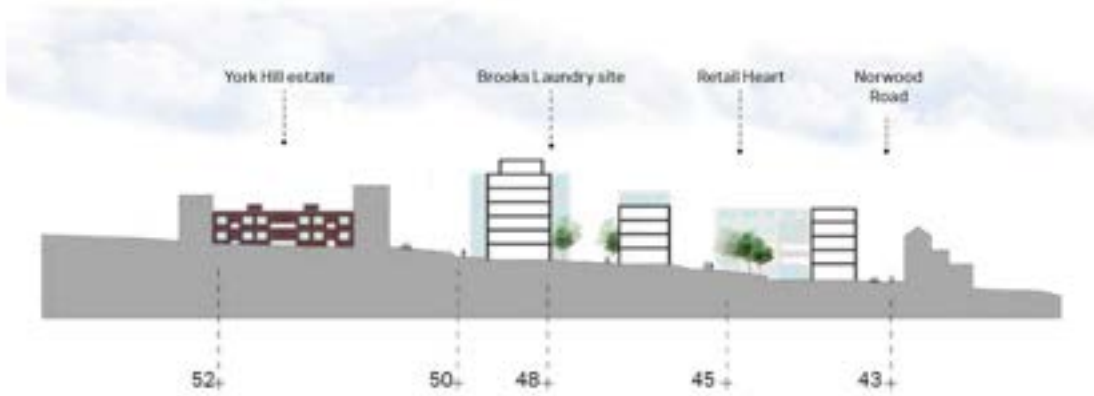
Retail Heart: Option 3C, looking west from Norwood Road
